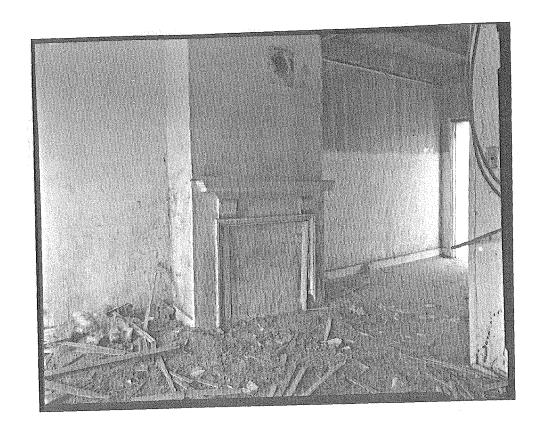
Ice Street, first floor of brick tenant house: view of north wall in north room, looking southwest.
